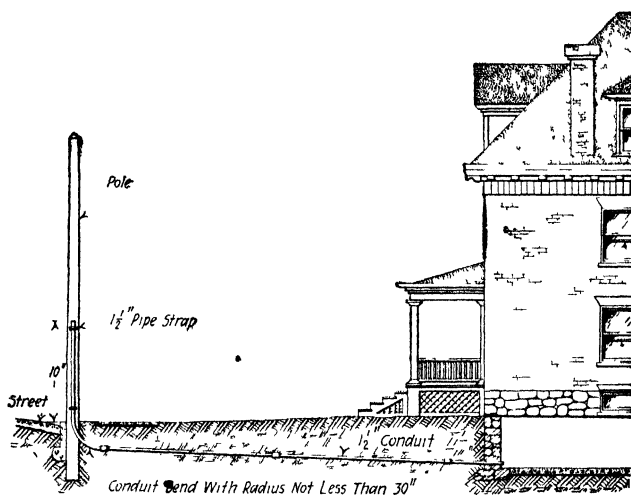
Run of private underground entrance conduit from a pole to the basement of a residence. Drainage is toward the basement (preferable direction).
